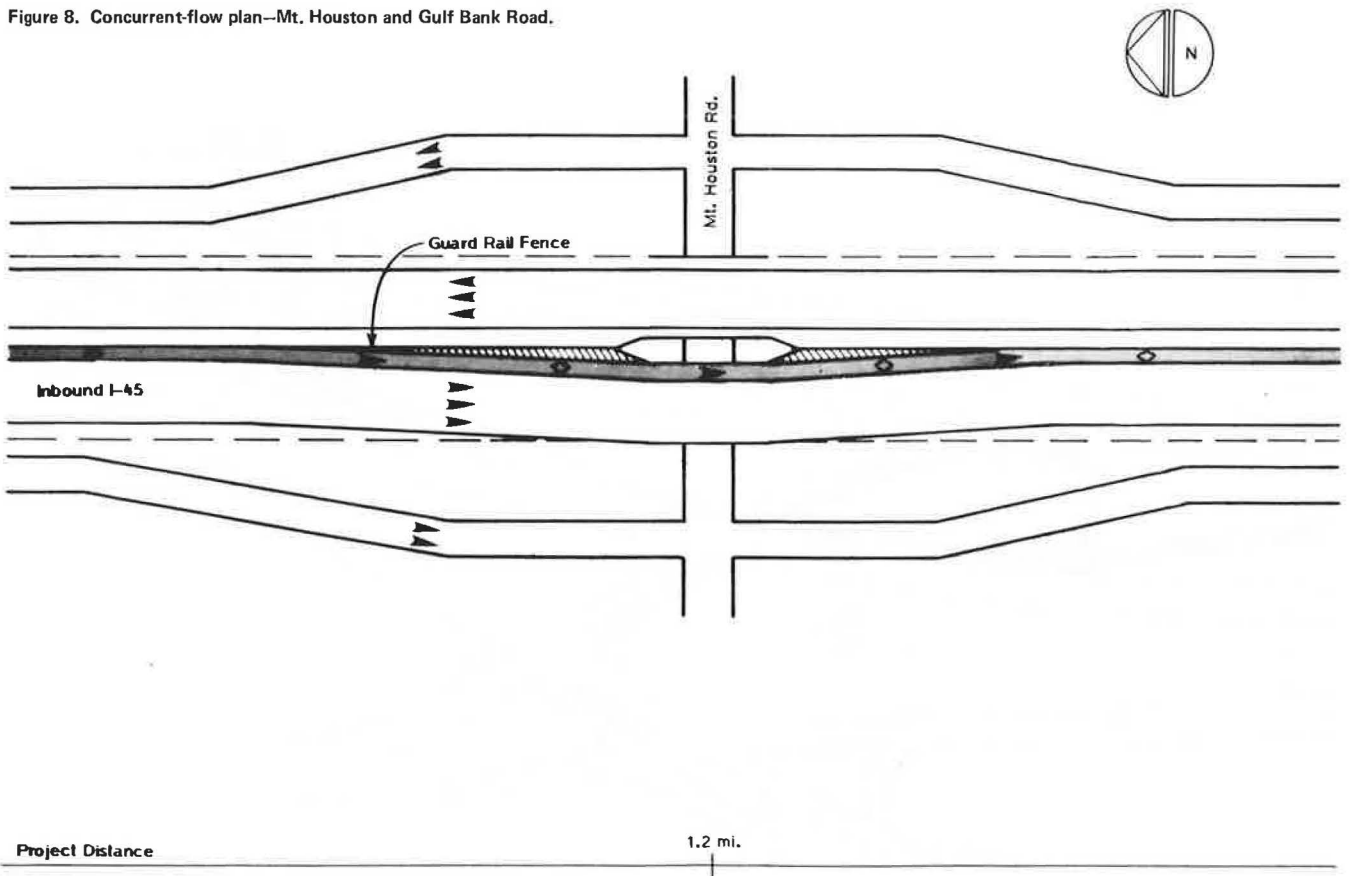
Concurrent-flow plan—Mt. Houston and Gulf Bank Road.
